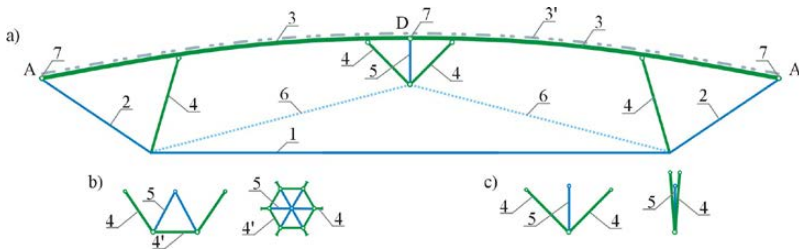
The frame, considered in the research. a – general view; b, c – central lattice structures (different embodiments). 1 – tensioning cable, 2 – diagonal cable, 3, 3’ – top chord beams (different embodiments), 4, 4’ – hinged struts, 5 – central tie, 6 – additional tie, 7 – hinge at the end of the beam
